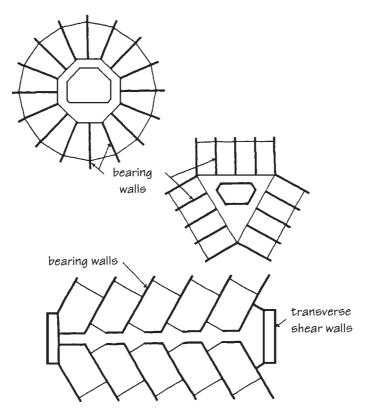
Examples of loadbearing walls oriented in multiple directions and functioning as shear walls to resist lateral loads in those directions.
